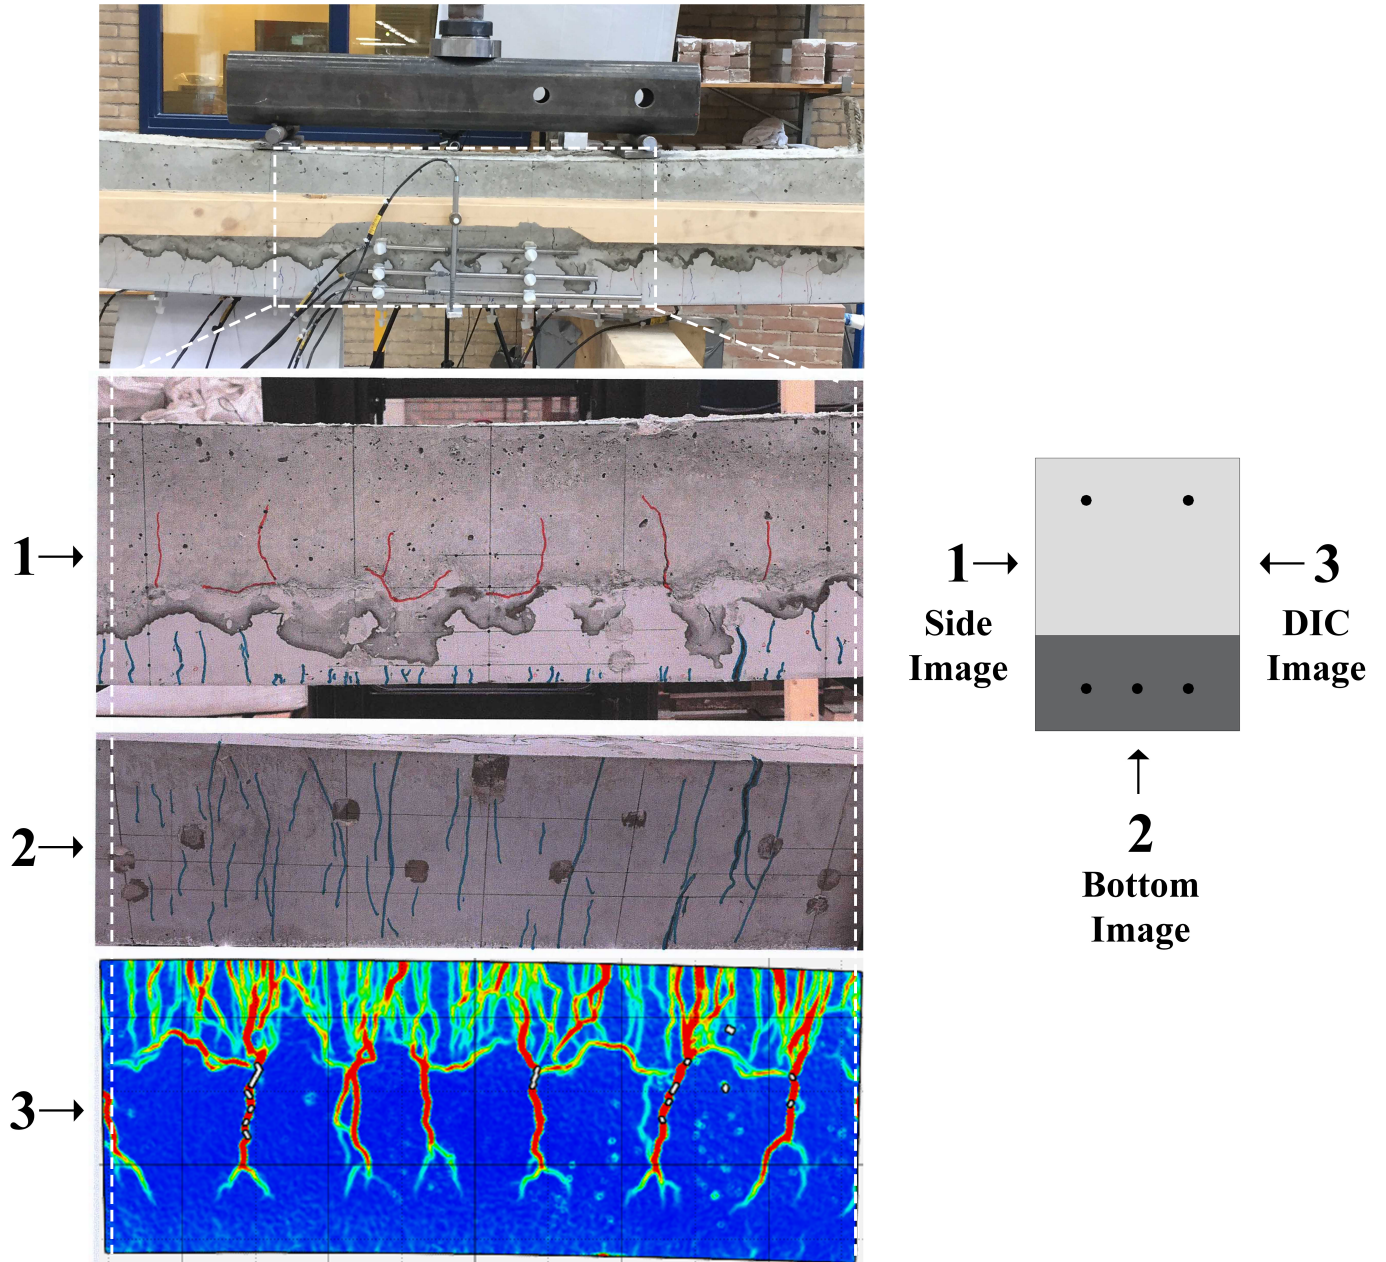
1-LVDT side, 2-Bottom side and 3-DIC side of P-PVA beam specimen
